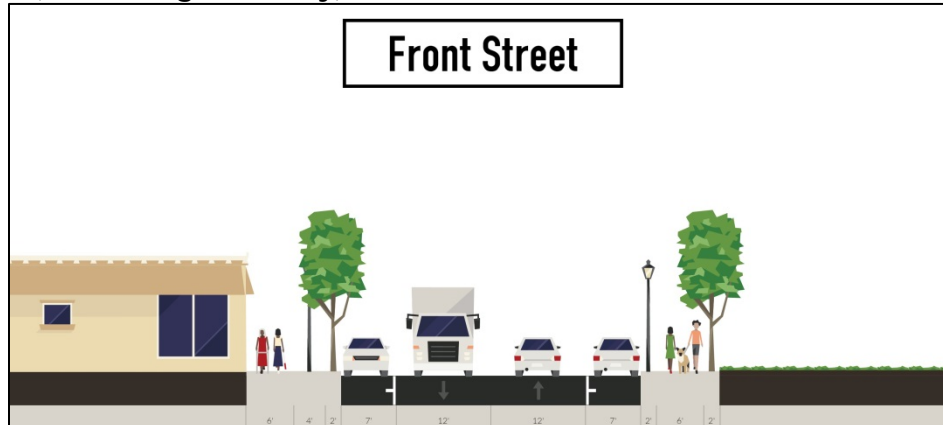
Front Street Cross-Section from Stillwell Avenue to Cedar Avenue – Alternative 1 (60 Feet Right-of-Way)
